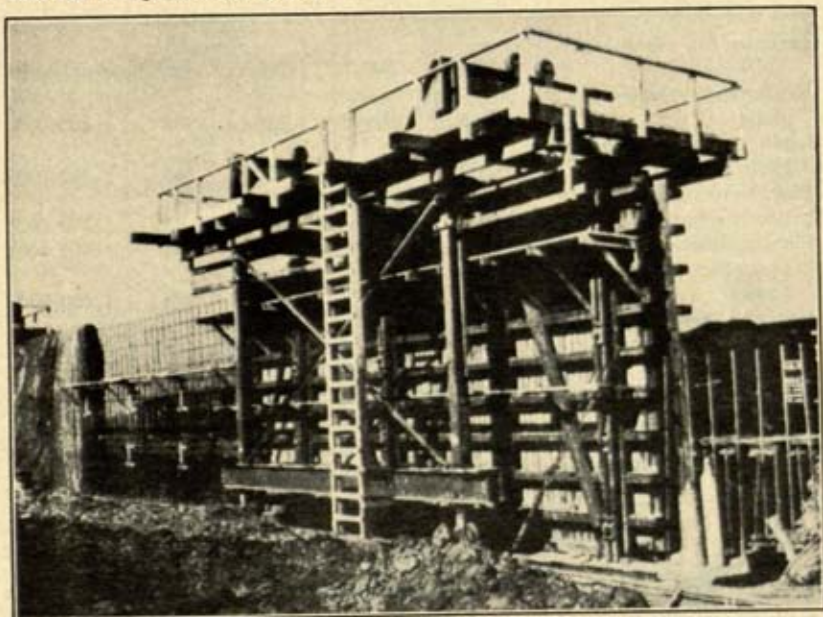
Prefabricated forms used to construct a flood wall. (*Corps of Engineers, U.S. Army.*)
